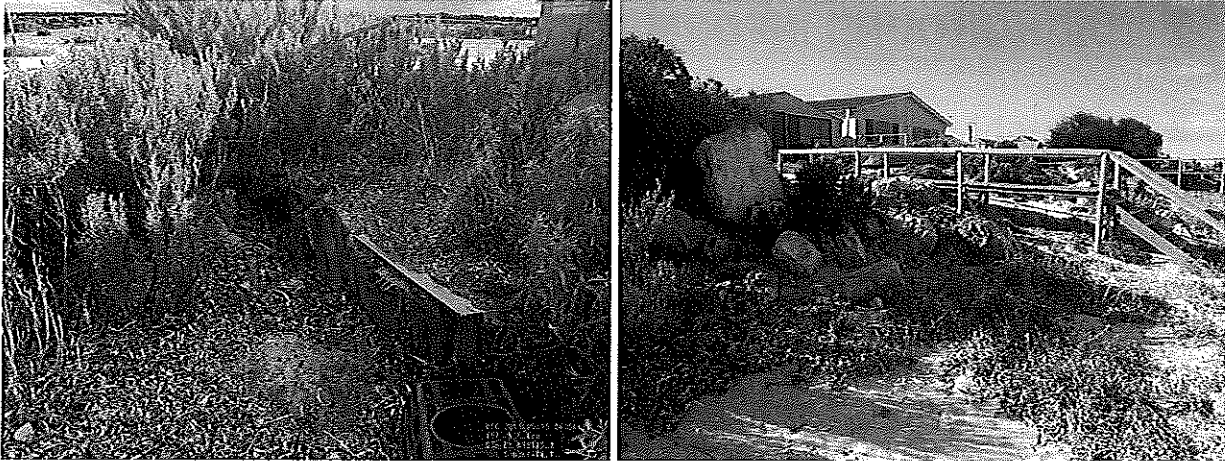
Ad Hoc Protection Measures and Timber Beach Accessway
